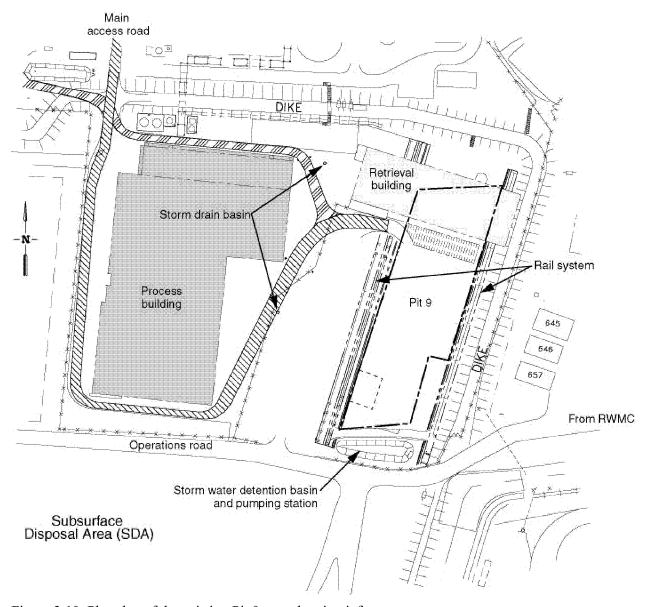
Plot plan of the existing Pit 9 area showing infrastructure.
